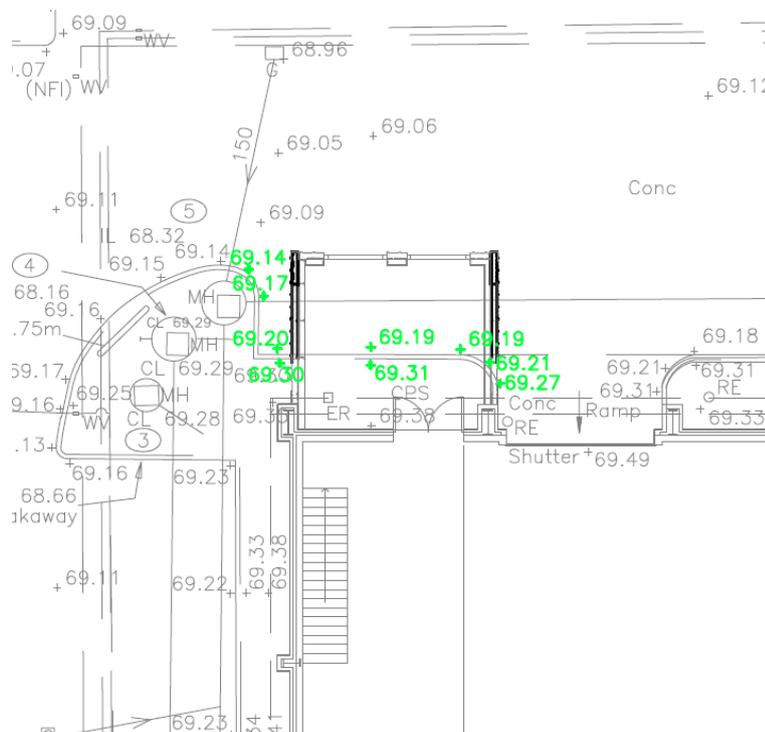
Extract of Topographical Survey and Site Layout Overlay: Northern Extension
